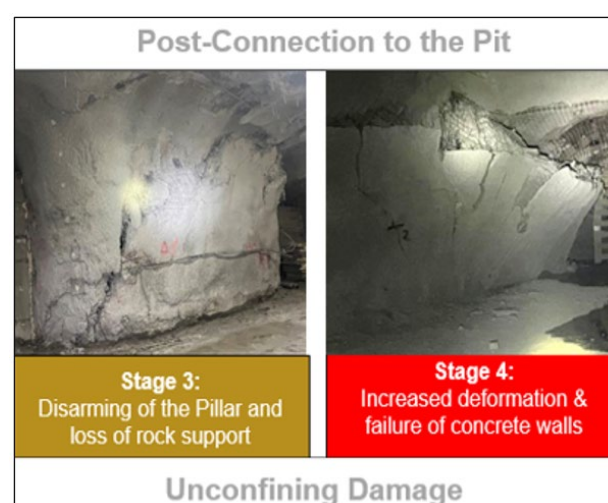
General reinforcement: damage conditions of confinement wall for production level pillars, Stages 3–4
